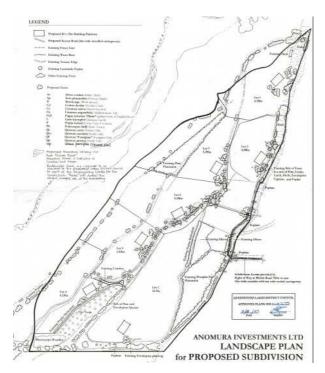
RM010375 Approved Subdivision and Landscape Plan
